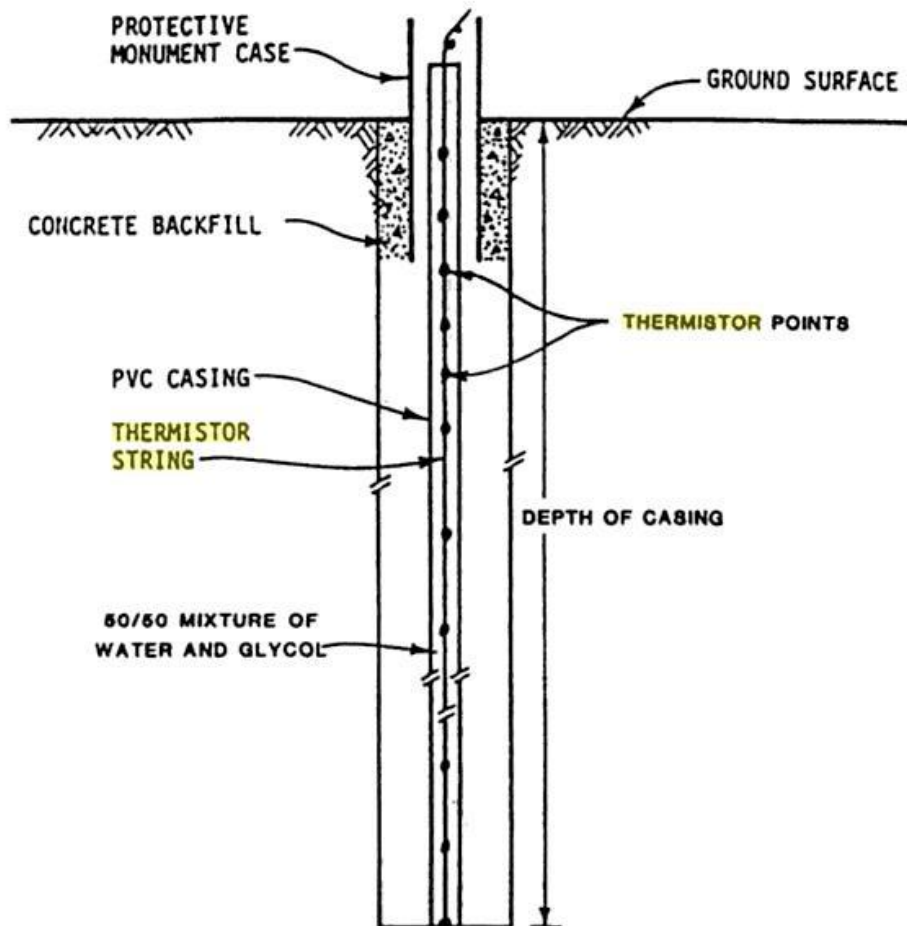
Cross Section Showing the Thermistor String Installation Procedure [Esch 2004]
